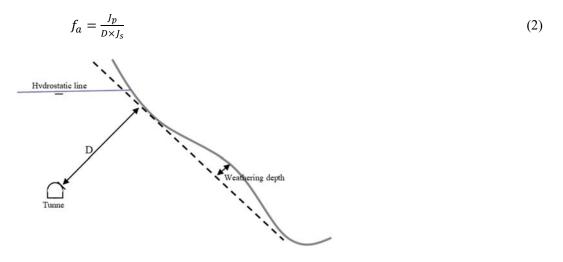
Typical topographic arrangement explaining D (Panthi, 2010).
